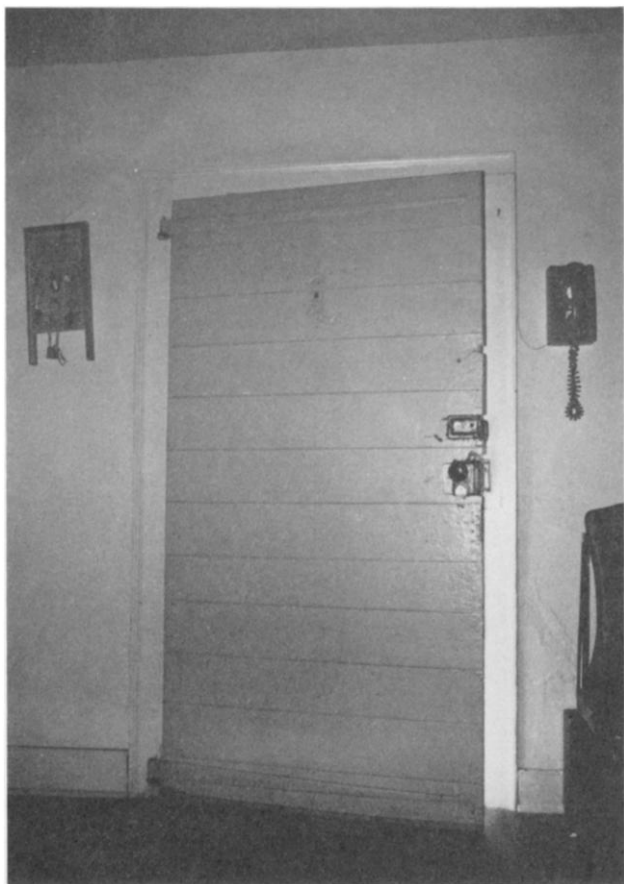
Abram Strickler House. Interior face of *Küche* door.
